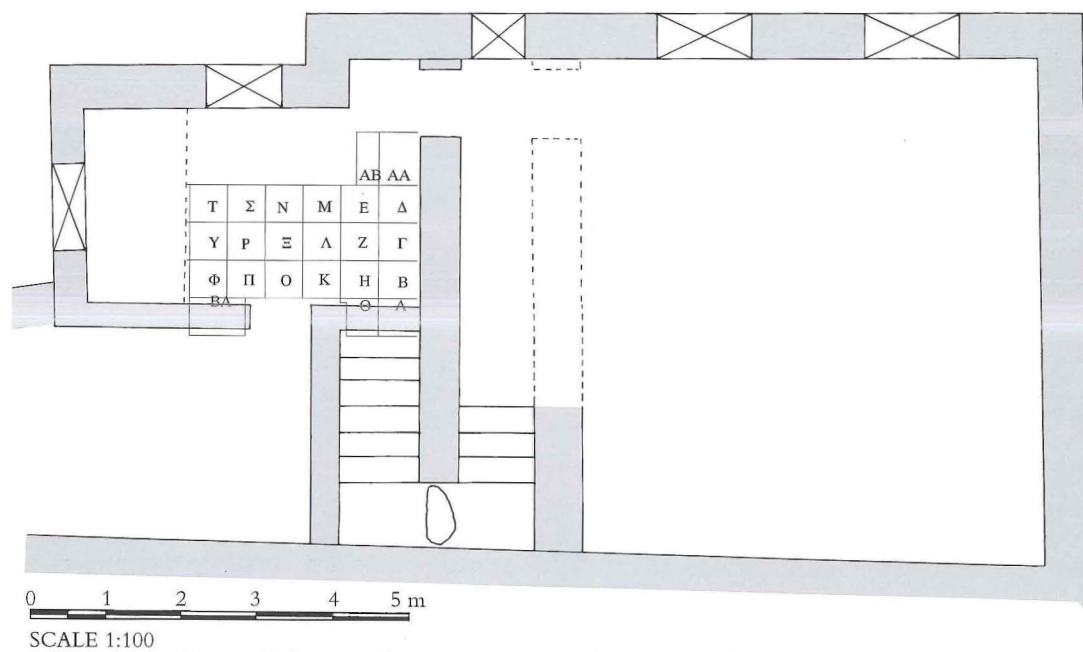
Northwest corner of palatial building, 1st floor with reconstruction of archive and staircase.
